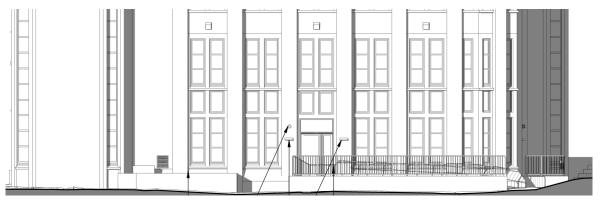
Proposed north-east elevation Sir Cyril Taylor Library, at ground floor level.
